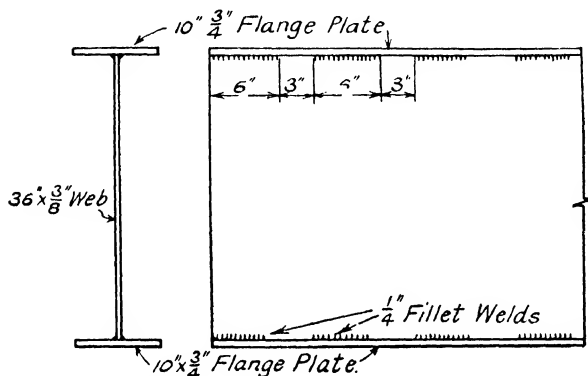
WELDS JOINING FLANGE PLATES TO WEB IN PLATE GIRDER
